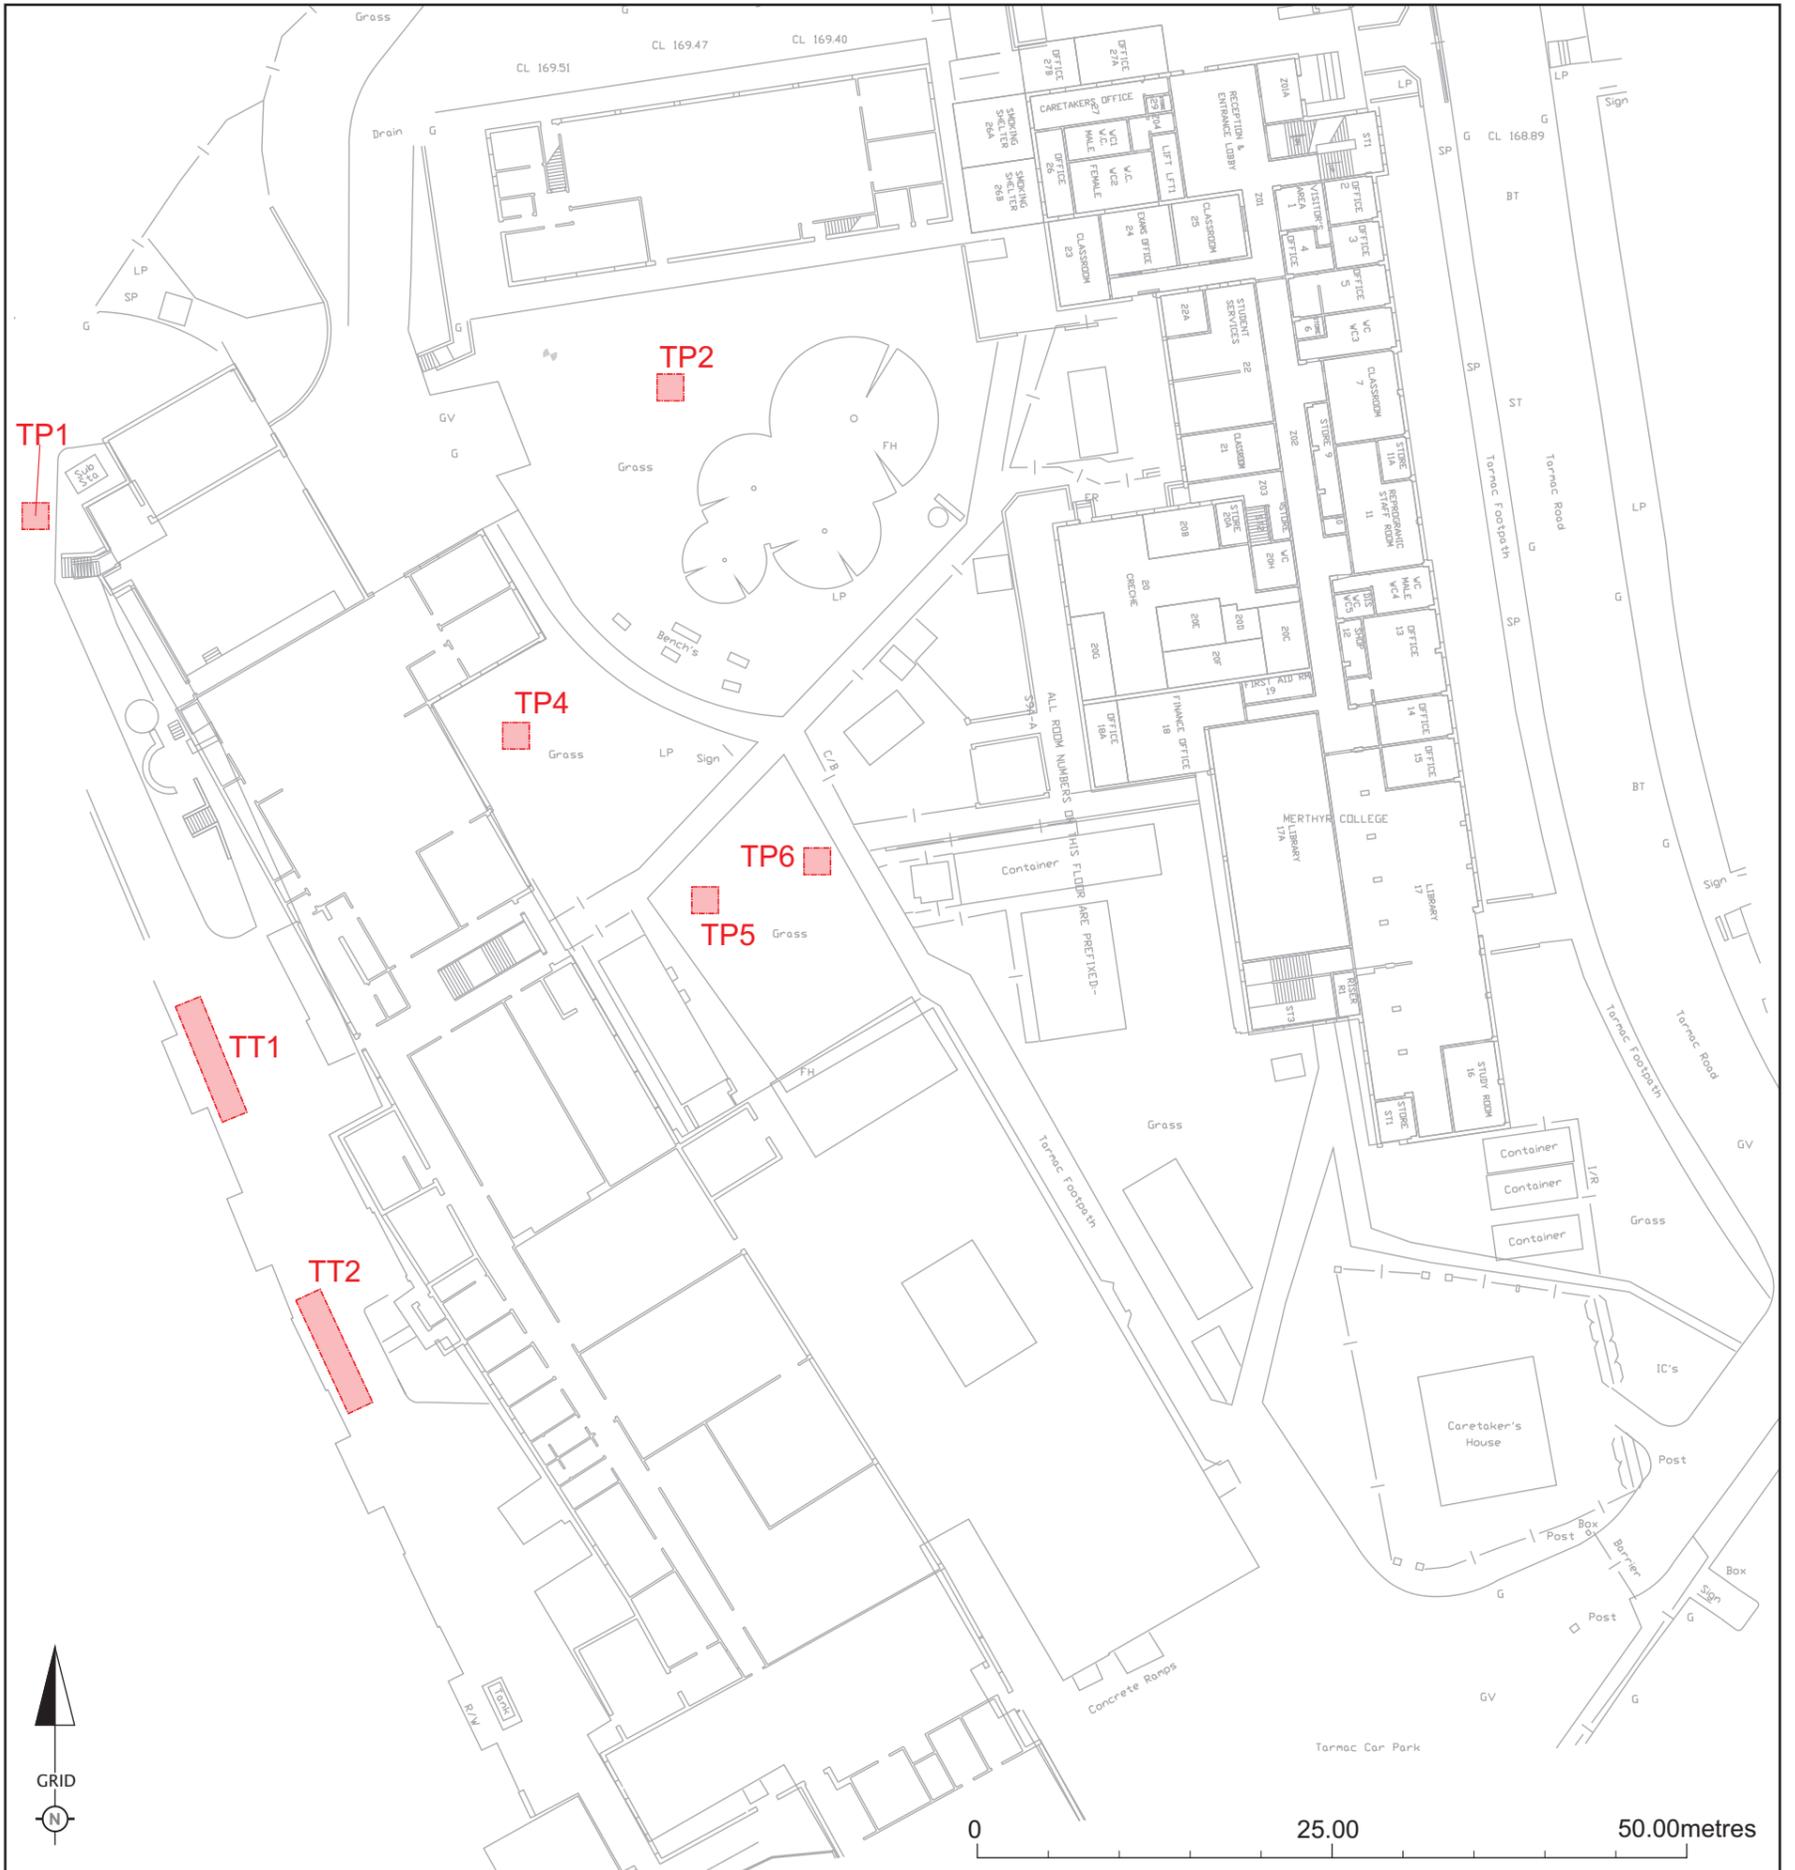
Plan showing Test Pits 1, 2, 4, 5, and 6, and Test Trenches 1 and 2
